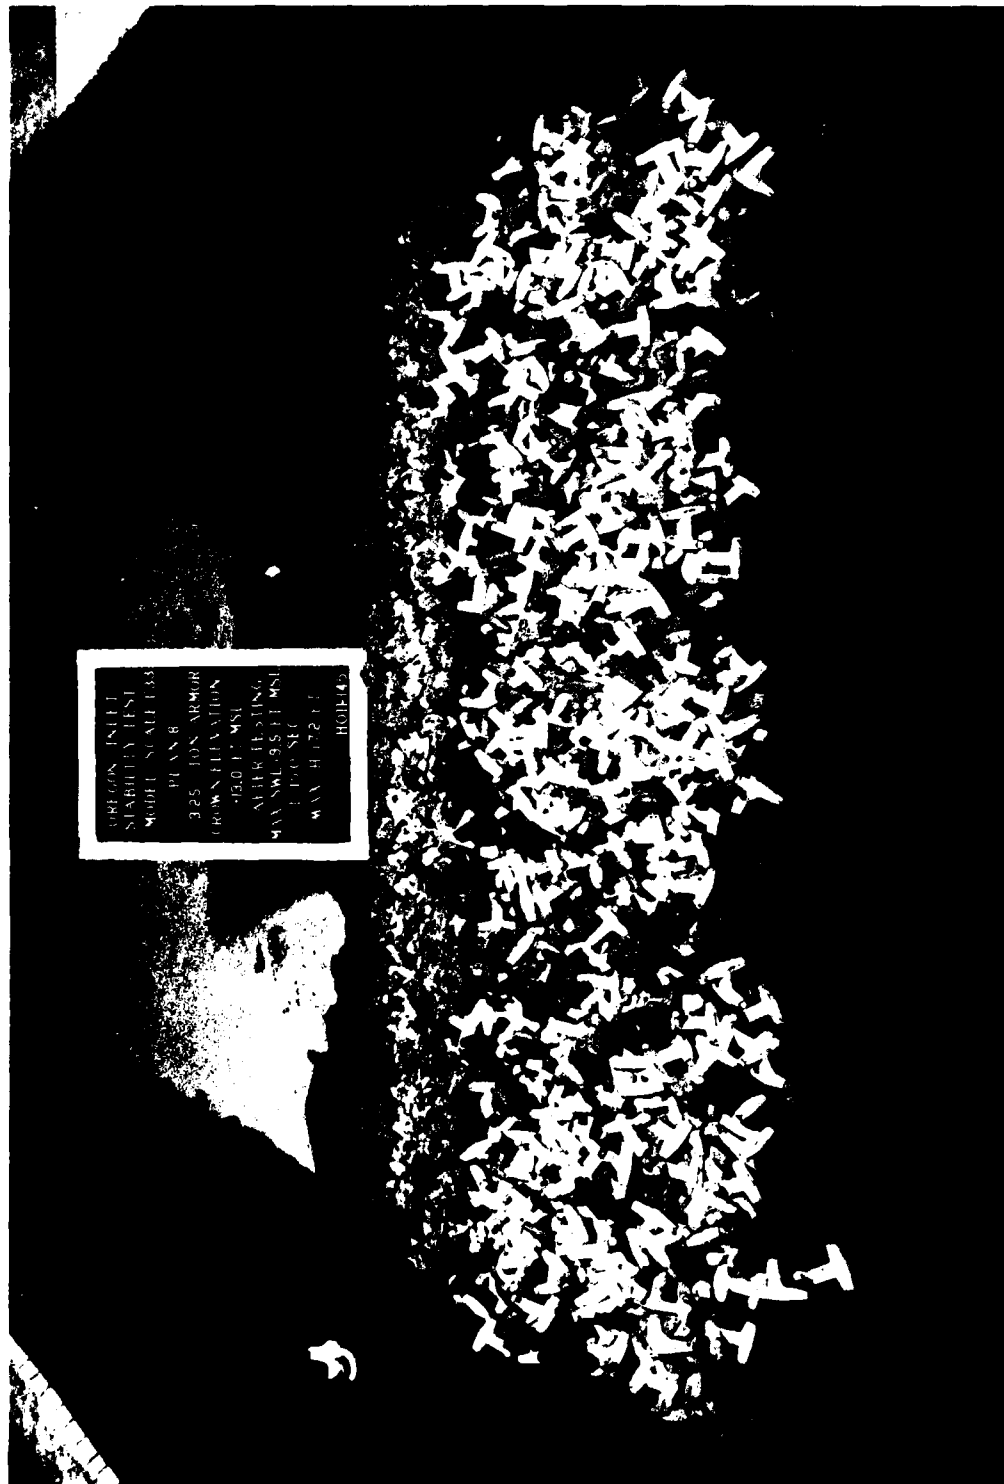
Channel-side view of Plan 8 after testing step 9 of the +9.5 ft NGVD hydrograph
